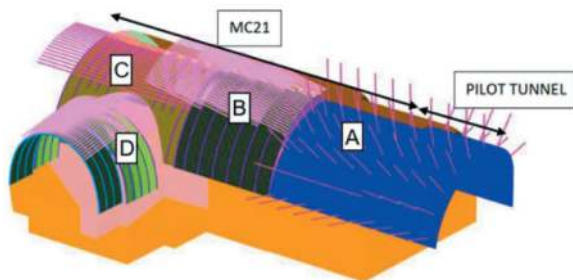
Mining sequence adopted A). East Side drift under rock bolts B). Spile support with elevated crown to enable canopy tube installation at intersection zone C). Complete side drift under canopy tube D). Adit excavation and break-in.
